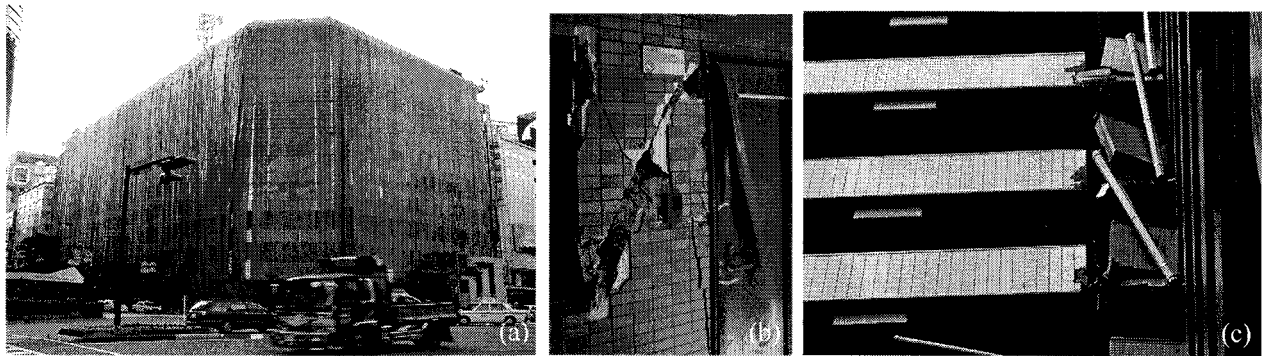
Non-engineering damage during the 2005 Fukuoka-Oki earthquake. Failure of window glasses (a), failure of entrance door by the neighboring non-engineering wall (b), and failure of expansion-joint (c).
